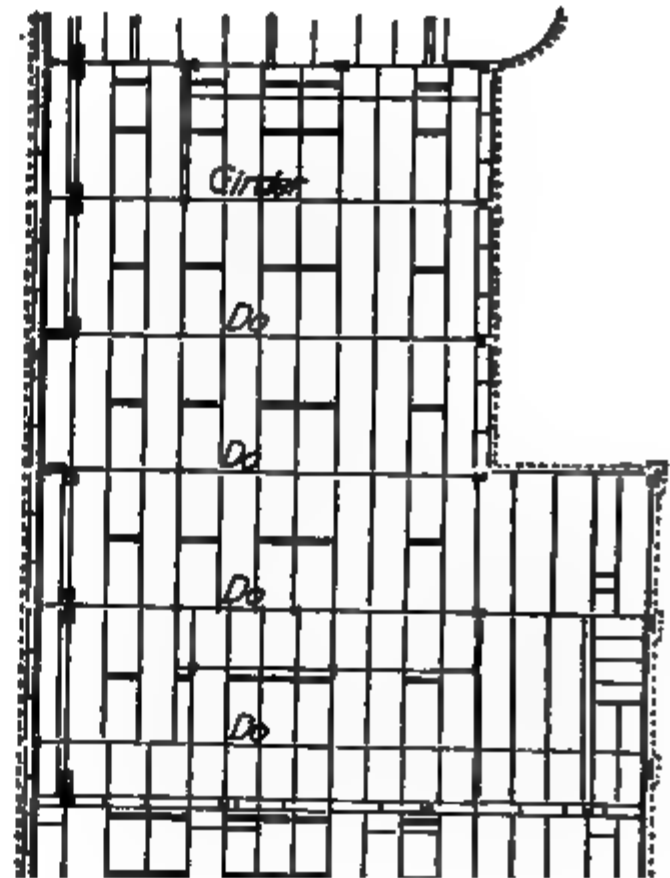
Racquet court floor framing, University Club of Chicago.
